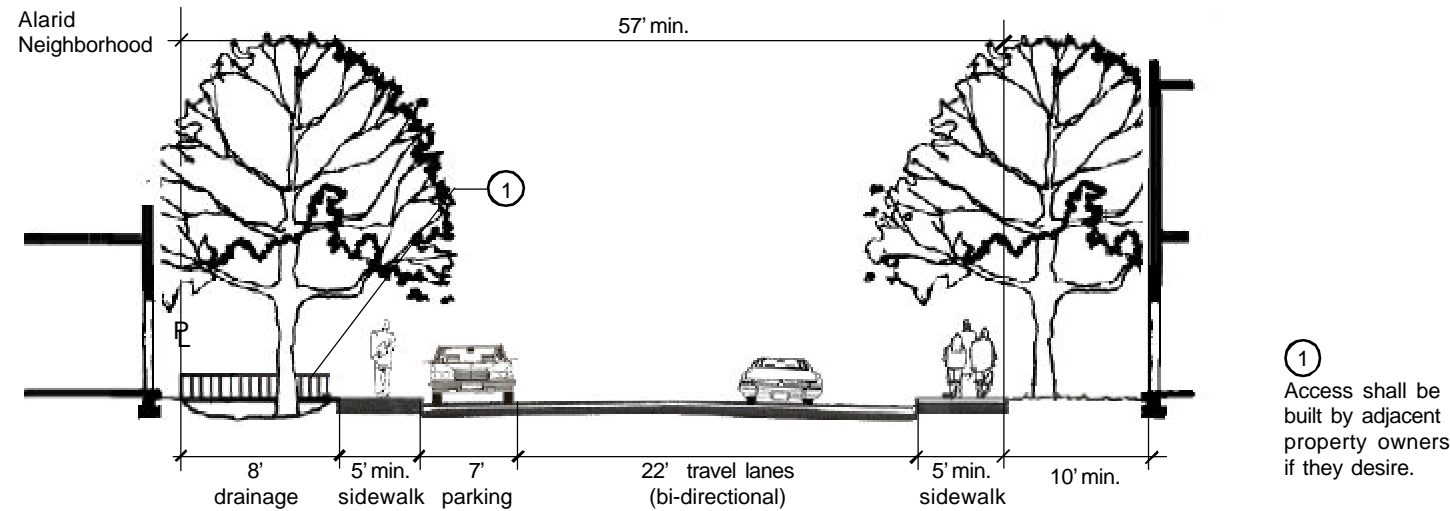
Road Section H -- West Guadalupe Neighborhood Edge Road
